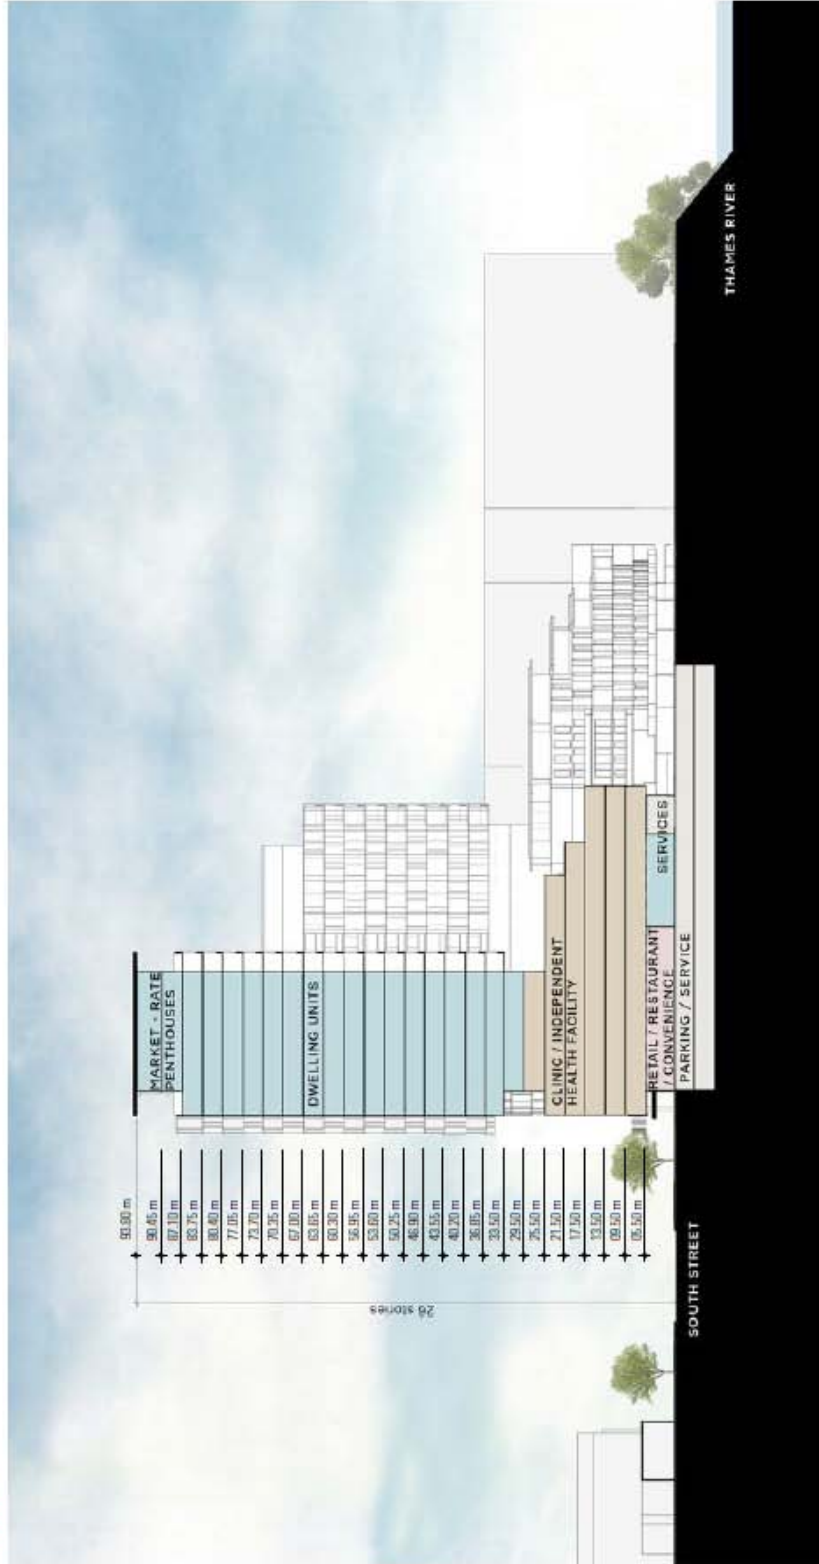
01 Site Section Through Market-Rate Condo Tower
